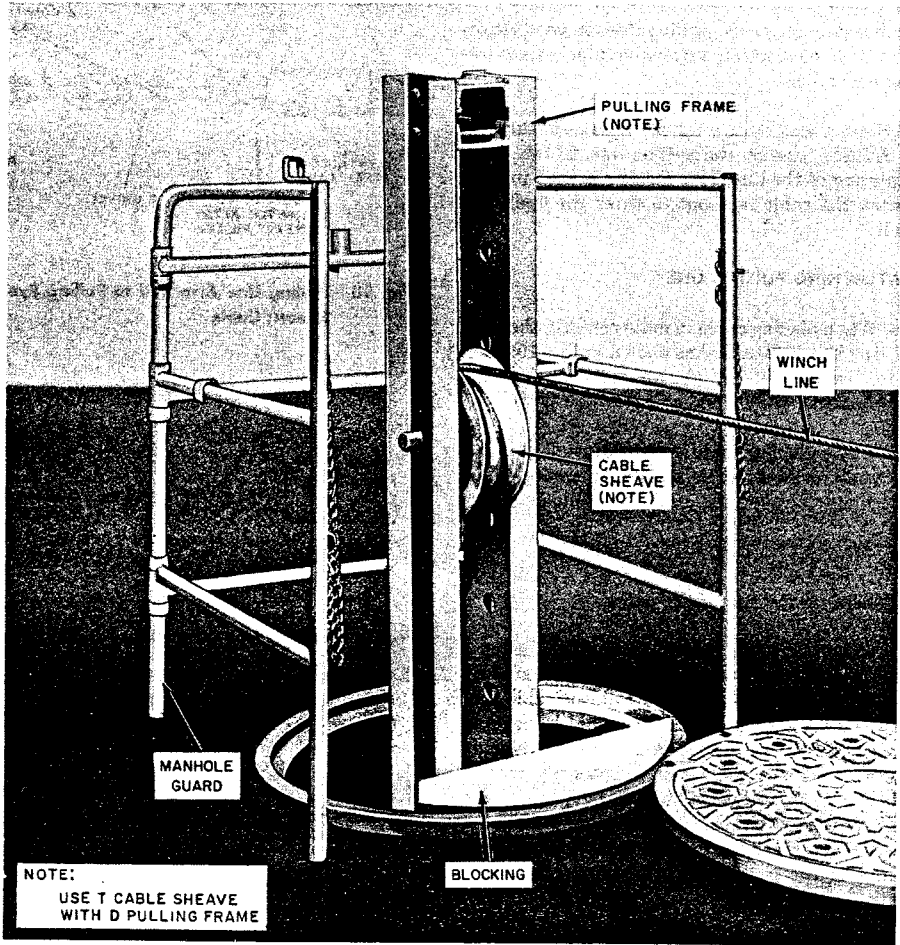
View Above Manhole Showing Pulling Frame and Cable Sheave Arrangement
